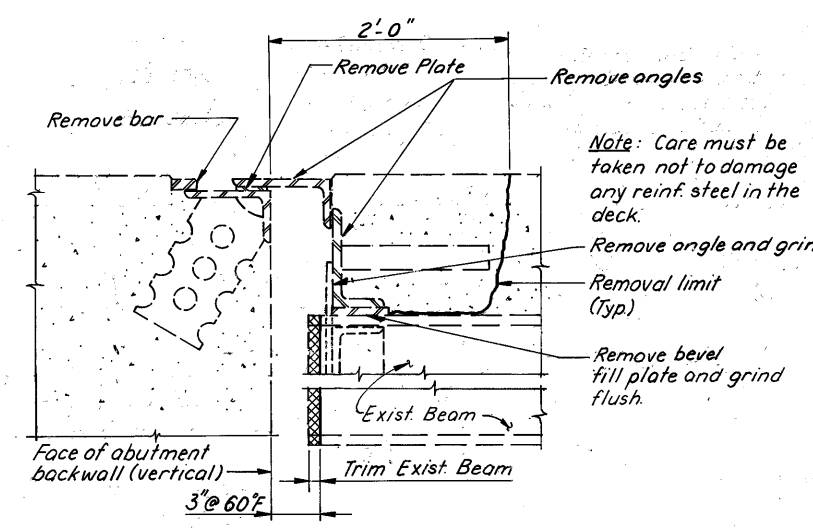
" CONCRETE SEALER DETAIL "2"
